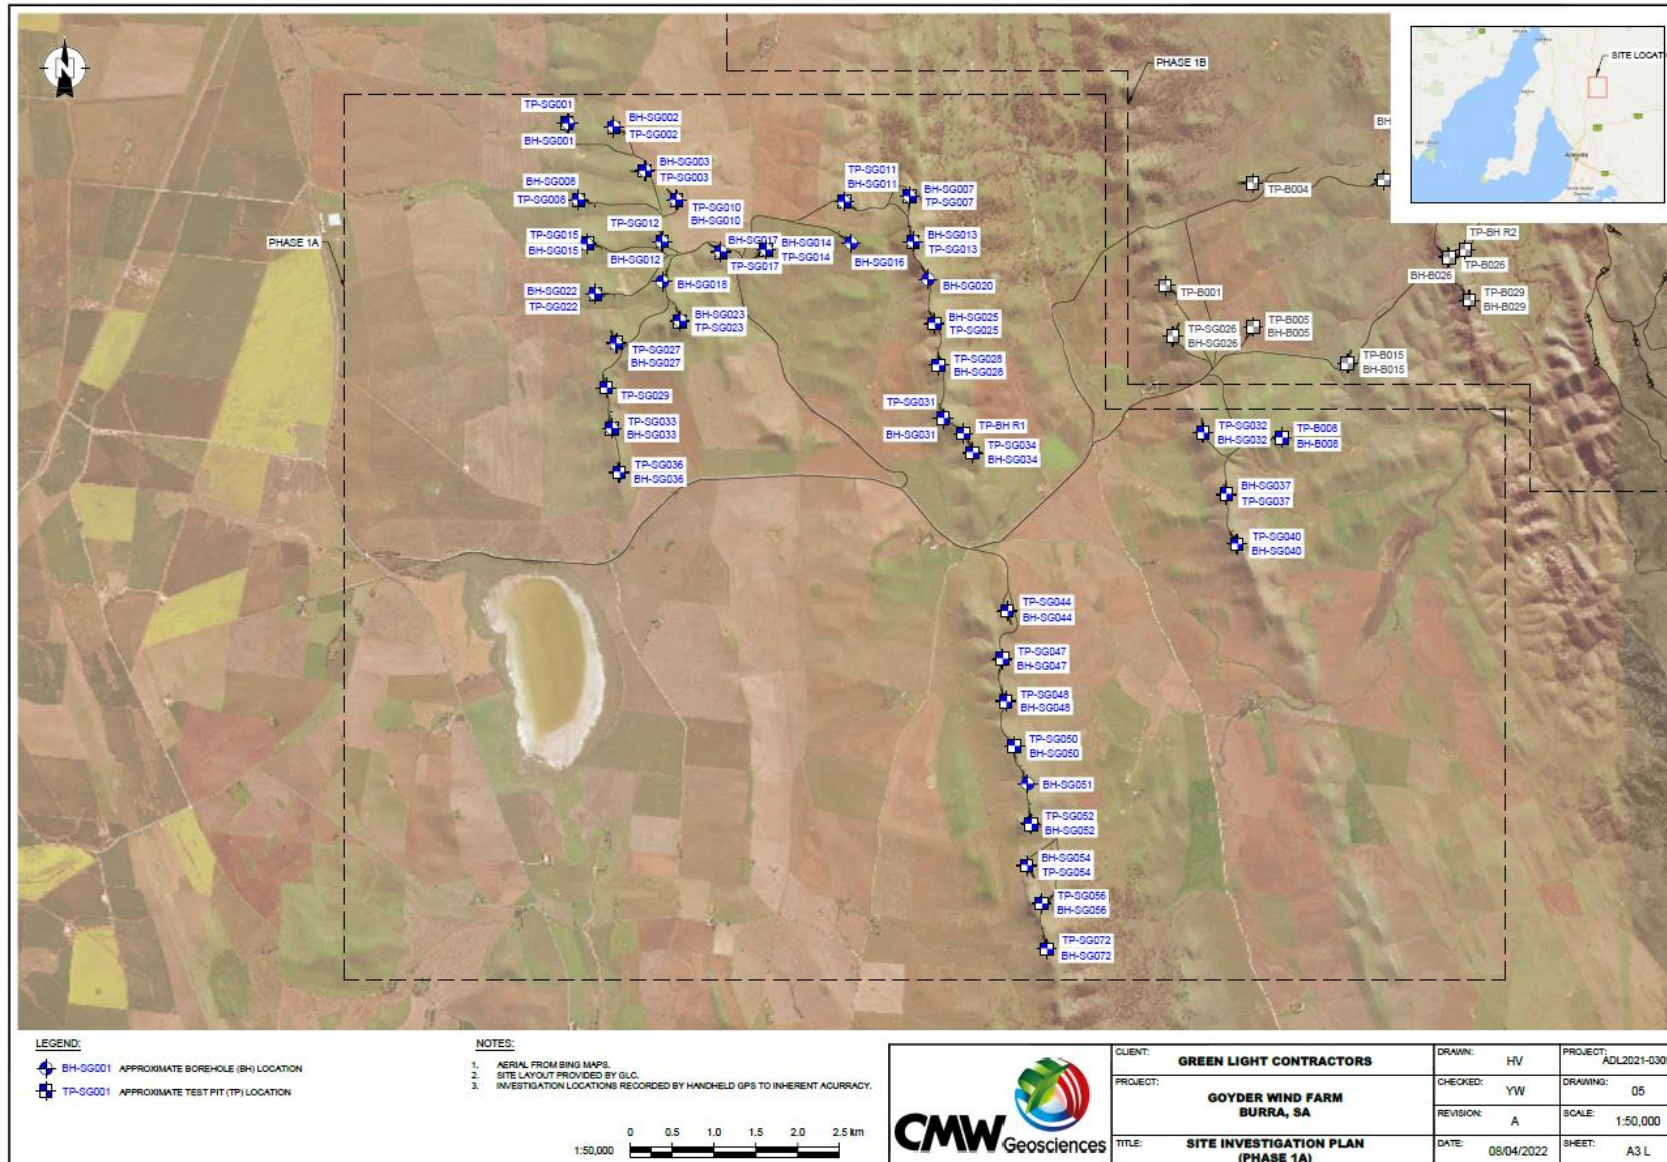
Geotechnical Assessment Site Identification Plan (Stage 1A)
